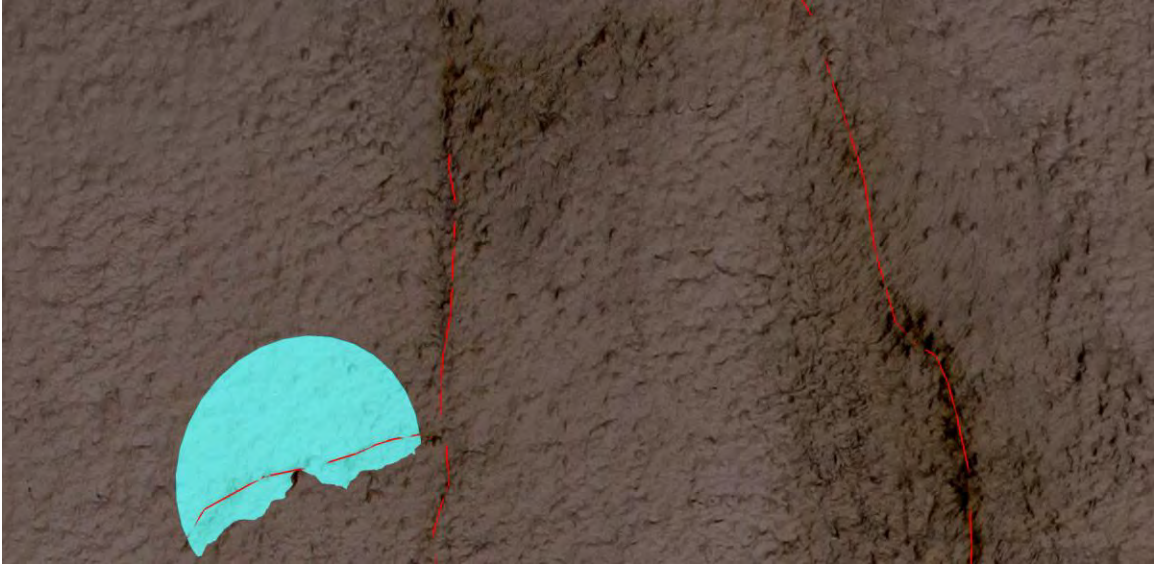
Detail of digitized shotcrete cracks on left wall by the southern portal; also visible is a plane interpolated through the crack trace.
